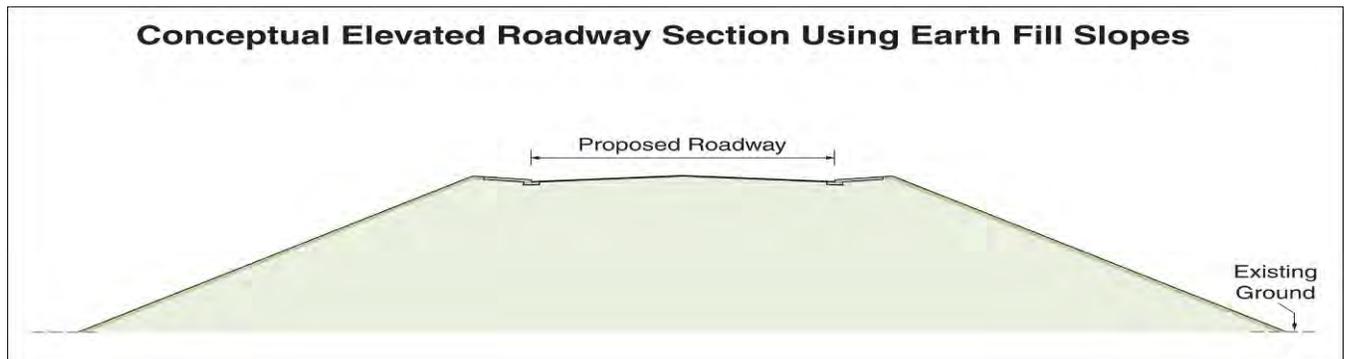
Conceptual Elevated Roadway Section Using Earth Fill Slopes
